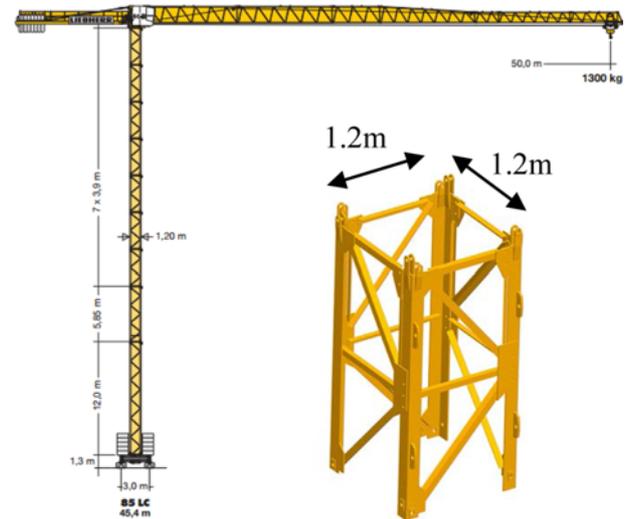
Tower Crane LIEBHERR 85 EC-B 5
